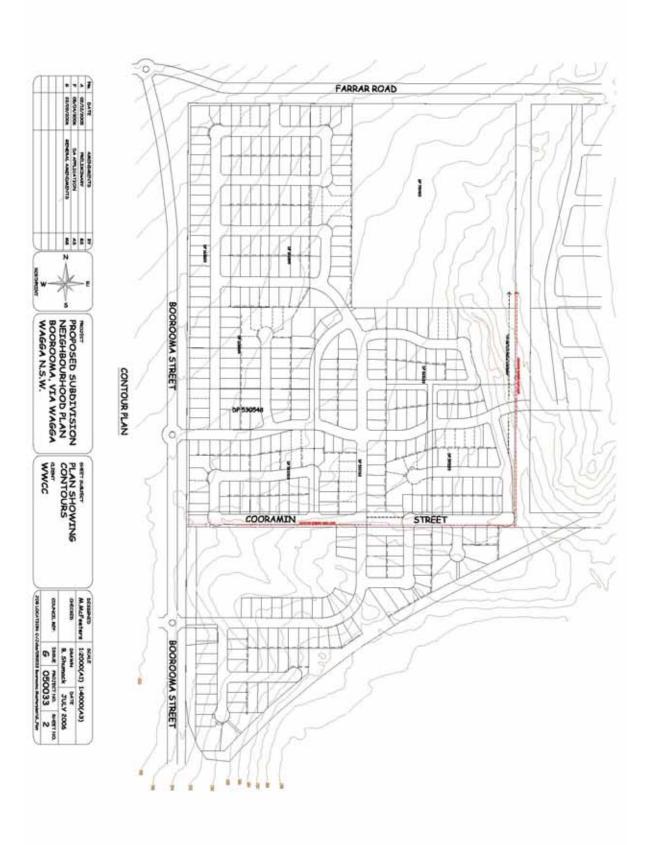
Boorooma Subdivision Neighbourhood Plan
